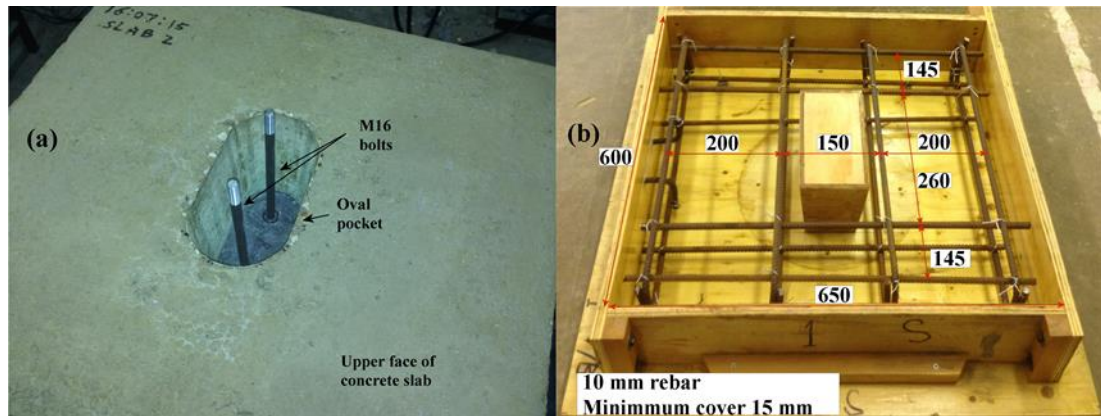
Slab overview (a) positioned over the steel beam (b) reinforcement details
